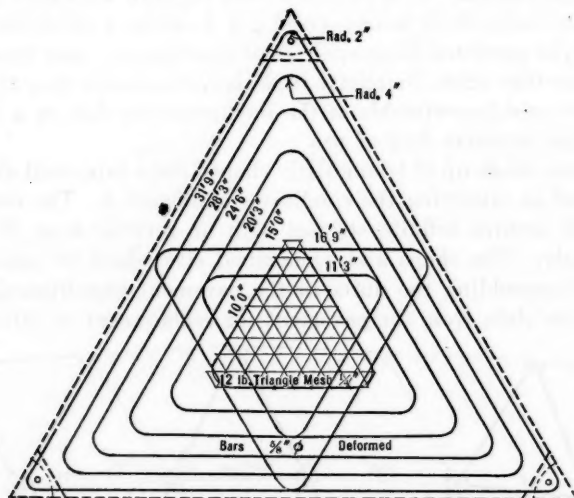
STEEL ASSEMBLY PLAN, TRIANGULAR HIGHWAY PAVEMENT UNIT.
